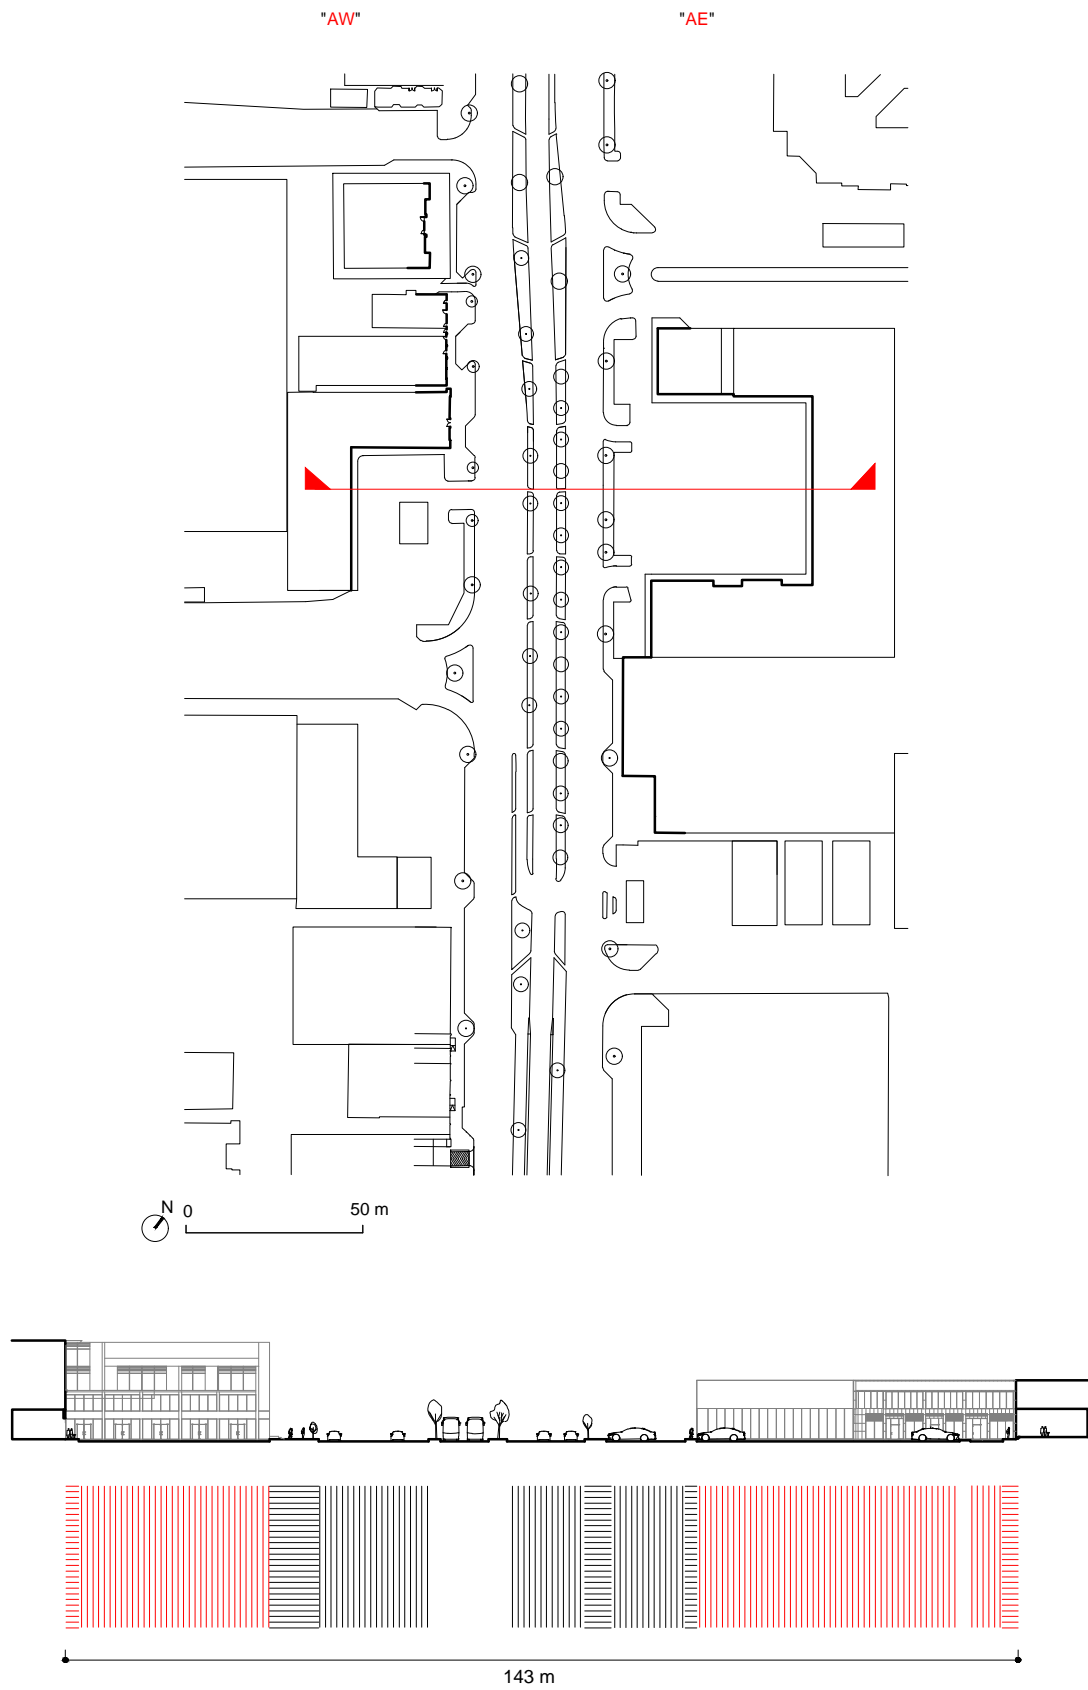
Khalid bin Al-Waleed Street: Plan and cross-section of sample "A." (Source: Author's Edition).
